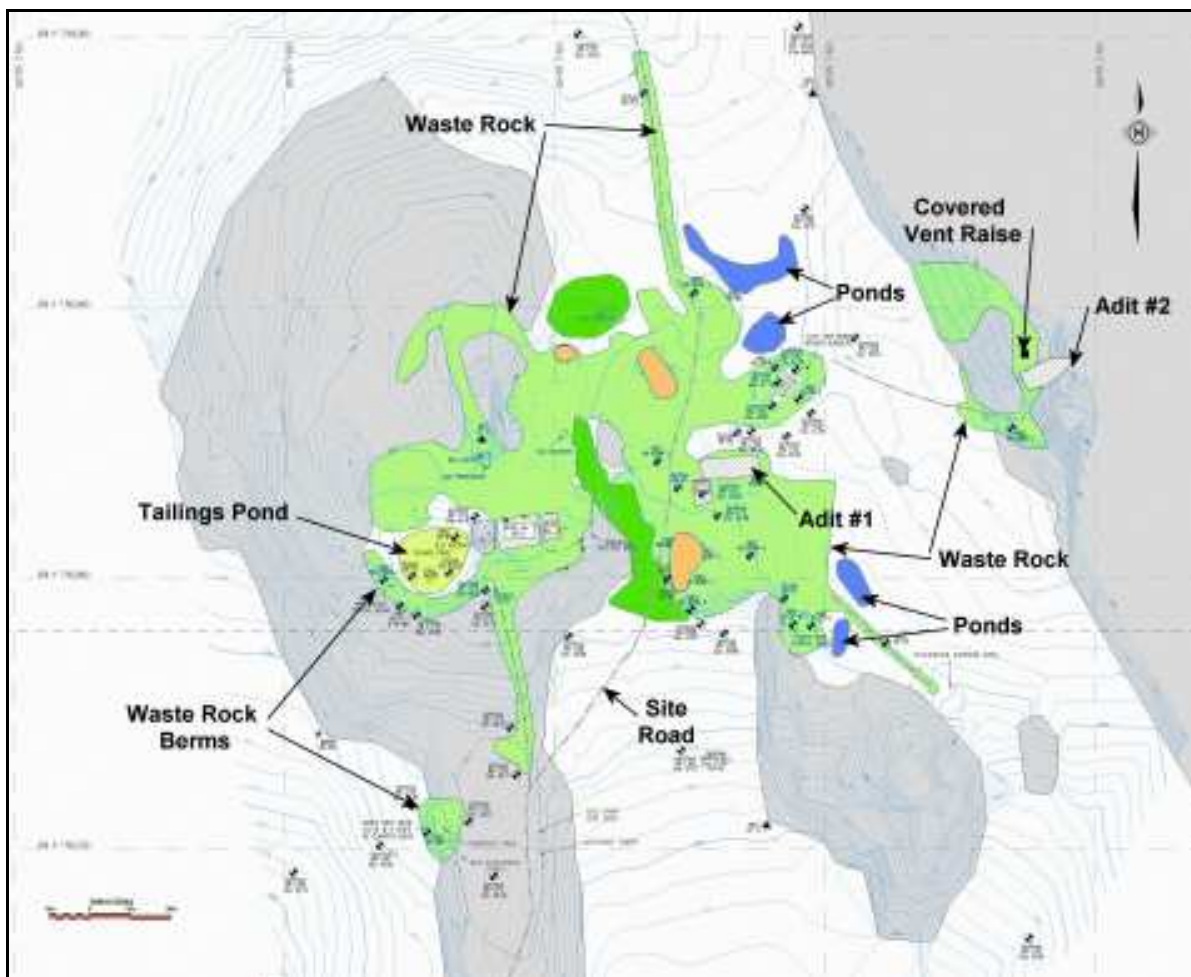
Location of main geotechnical features at Roberts Bay mine site.
